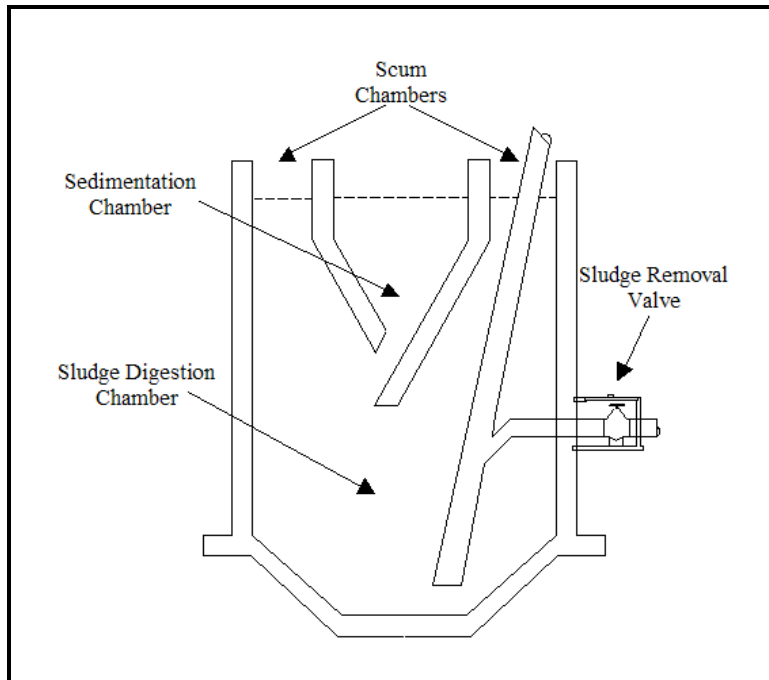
Typical Cross Section of Imhoff Tank (Mikelonis, 2008)
